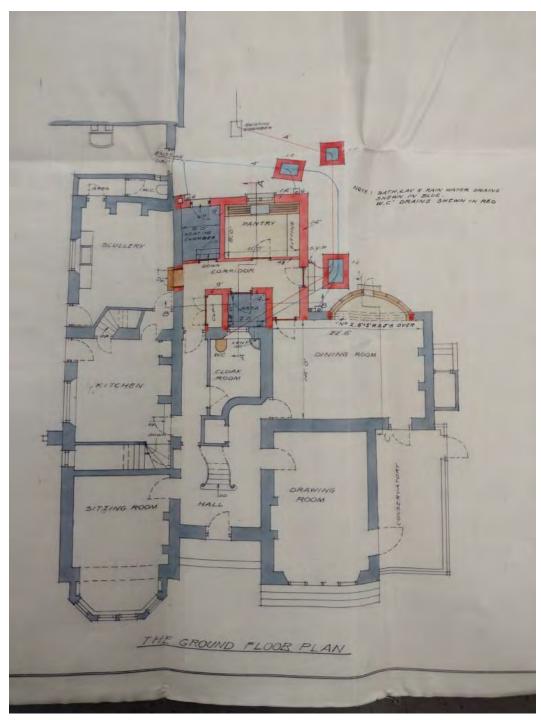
1929 planning proposals – ground floor (BARS ref: RDBP 1/1314)
